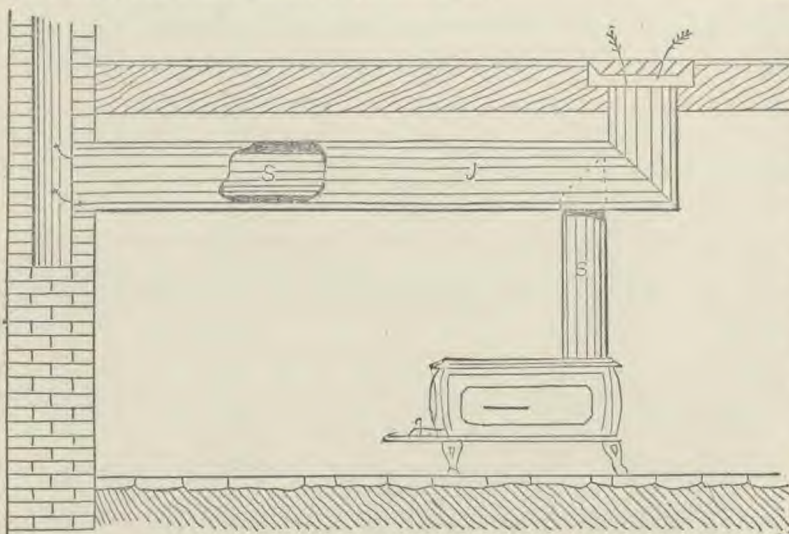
A method of Ventilating Churches. The pipe of a stove in the basement is jacketed throughout its horizontal length, thus inducing a draft from the opening in the floor above connected with it. S, Stove Pipe. J, Jacket around Stove Pipe.
